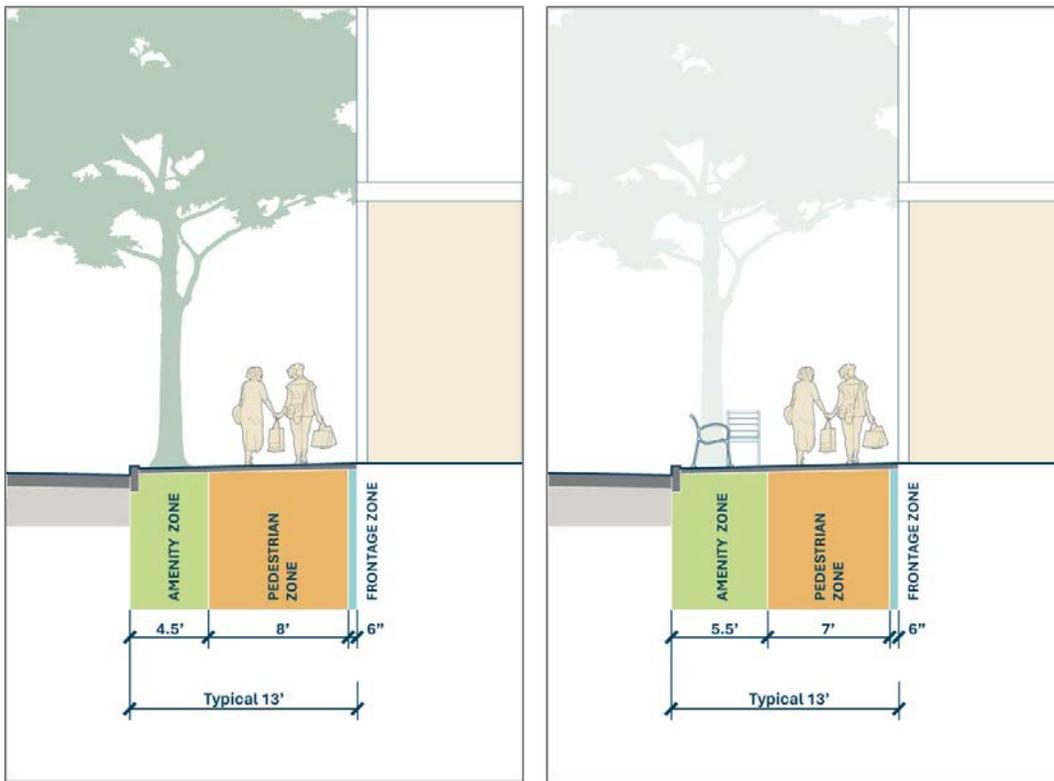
Left: Section A - Sidewalk at tree well. Right: Section B – Sidewalk with public seating
